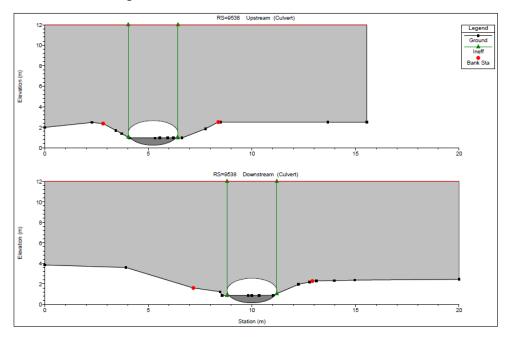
Culvert under the M1 modelled in HEC RAS
